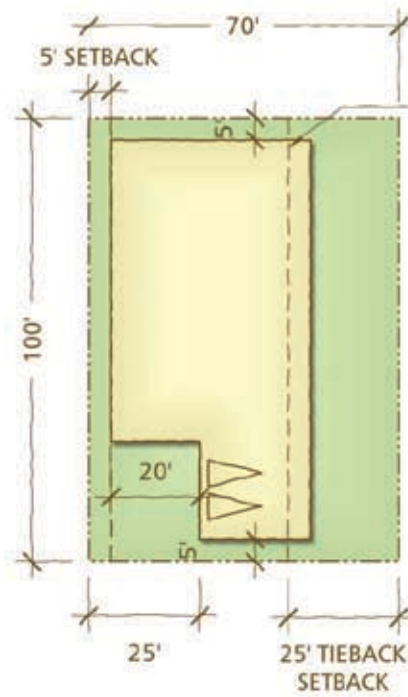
(A): Typical Section 1 Lots 1-11
